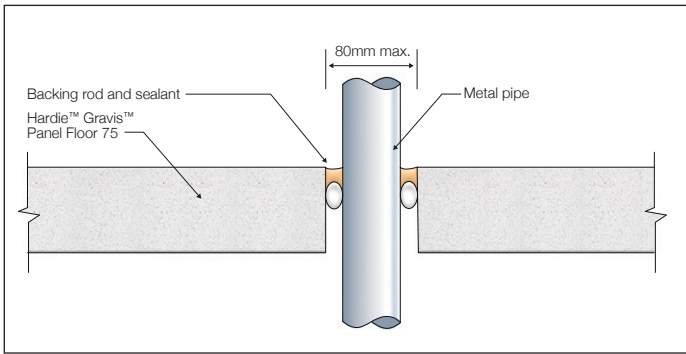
FLOOR WITH TYPICAL PENETRATION
